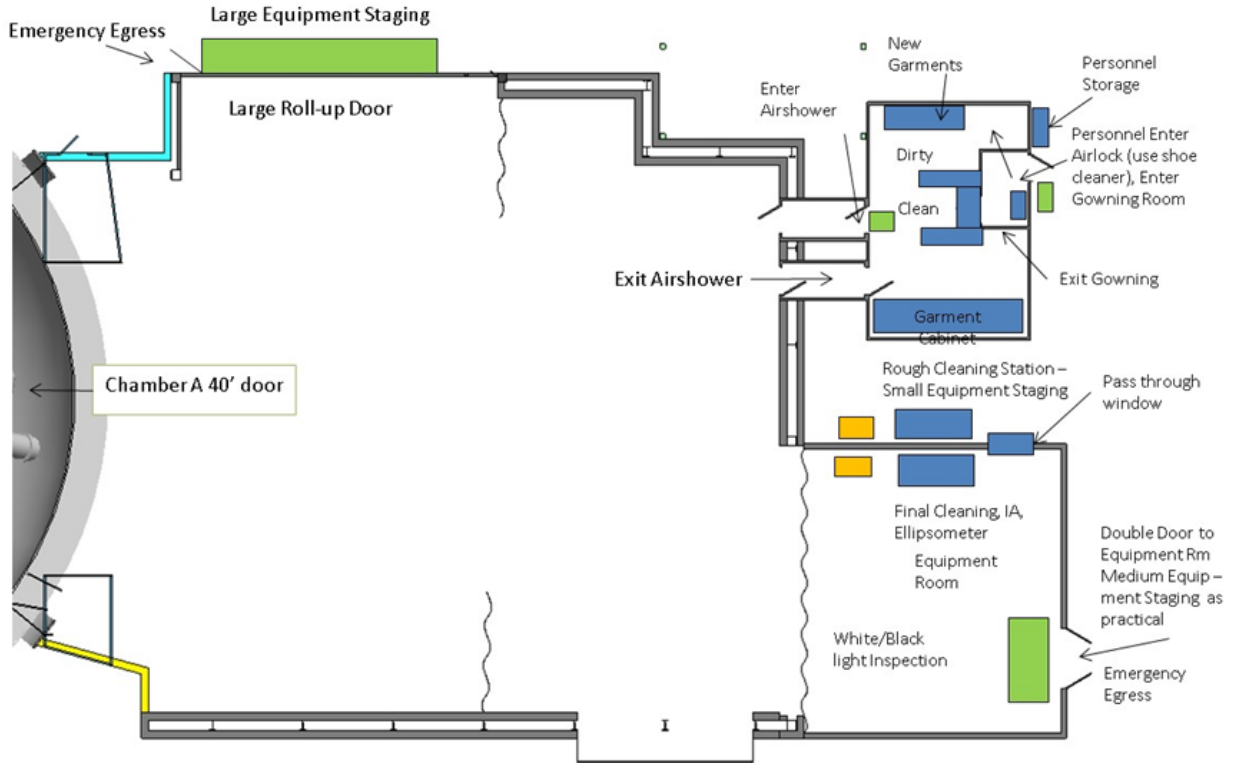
Floorplan of JWST cleanroom attached to Chamber A.² (Drawing credit: NASA)
